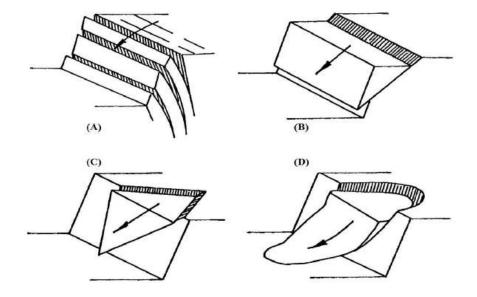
Simple structurally-controlled failures of rock slopes: (A) toppling failure, (B) planar failure, (C) wedge failure and (D) circular failure. From Wyllie and Mah (2004).
